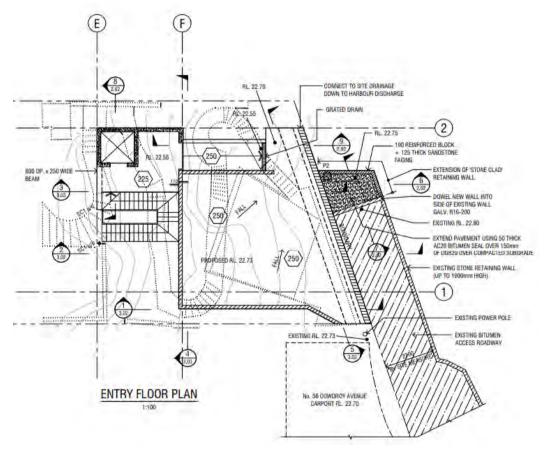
Site preparation works plan view for construction access including works within the adjoining public road reserve
